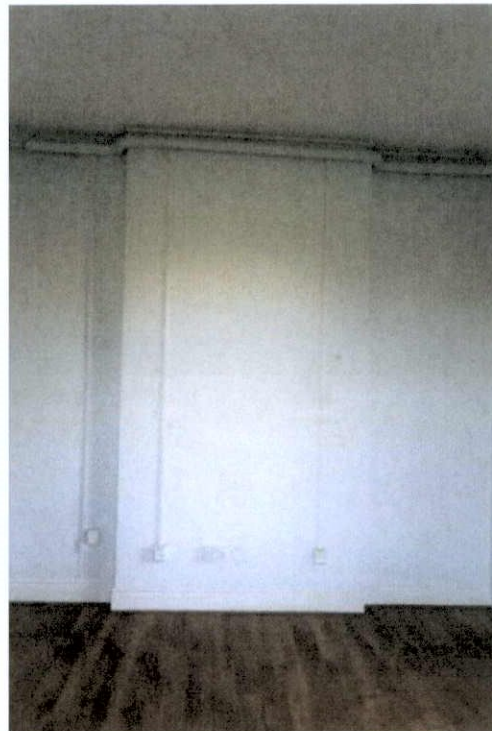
Chimneypiece removed. Contemporary services surface mounted throughout.
